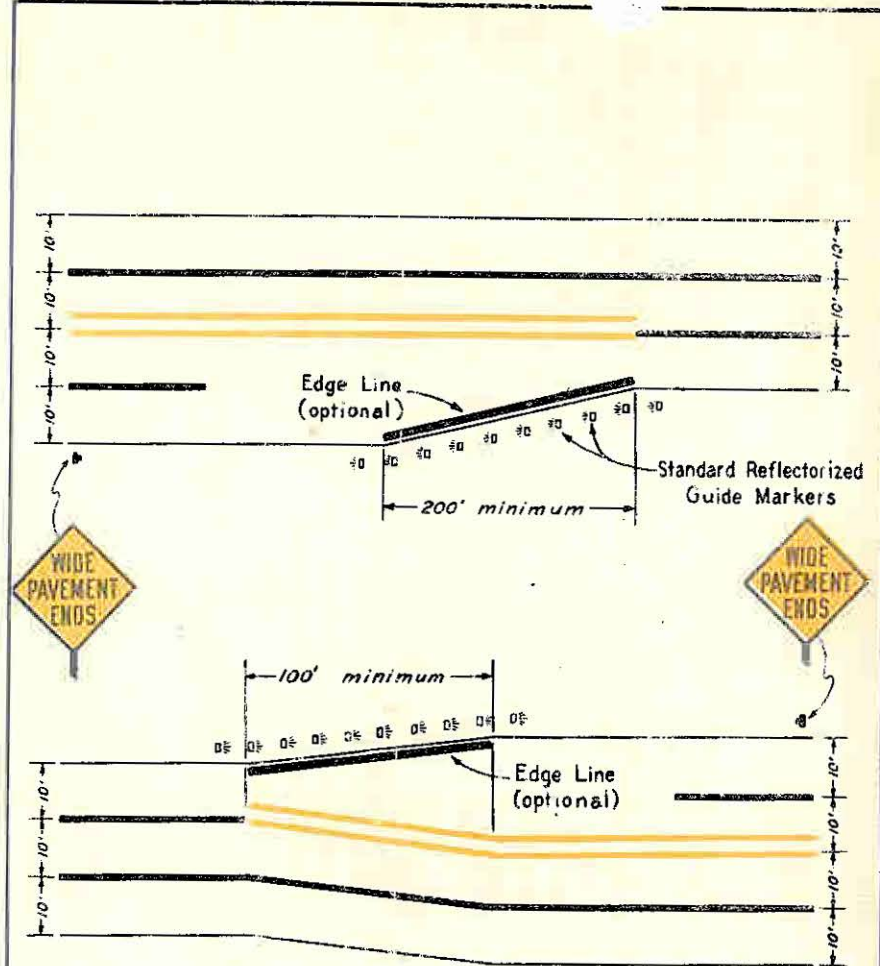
b - STANDARD PAVEMENT MARKINGS
